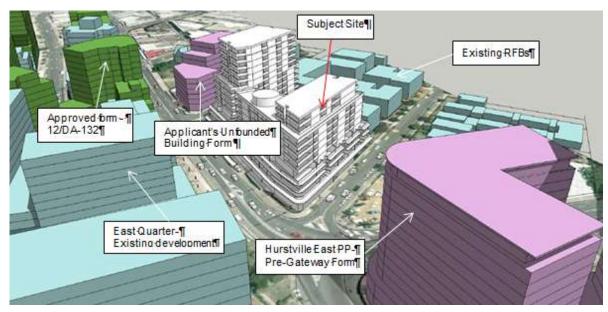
3D Images - Planning Proposal Birds Eye View – Corner Forest Road and Wright Street (Source: Planning Proposal Revision 6 – 11 March 2016)
